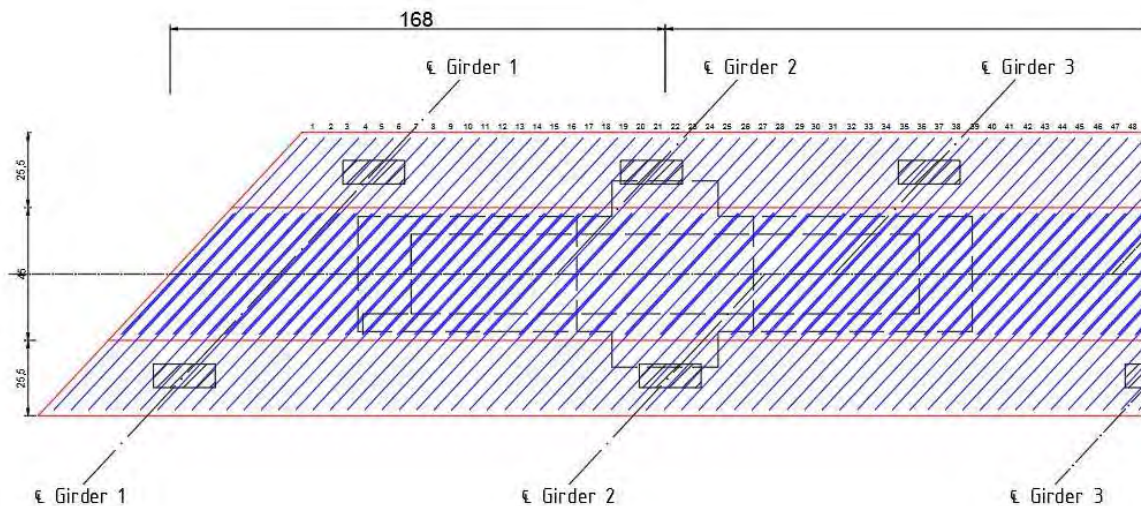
Case 1 for Bent 2 (Current Design of Skew Reinforcement, unit: inch)
